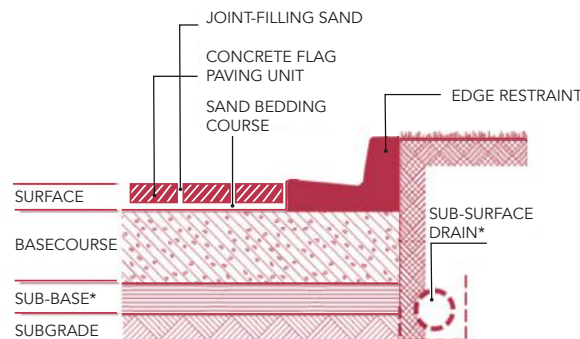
Typical Concrete Flag Pavement Cross-Section
